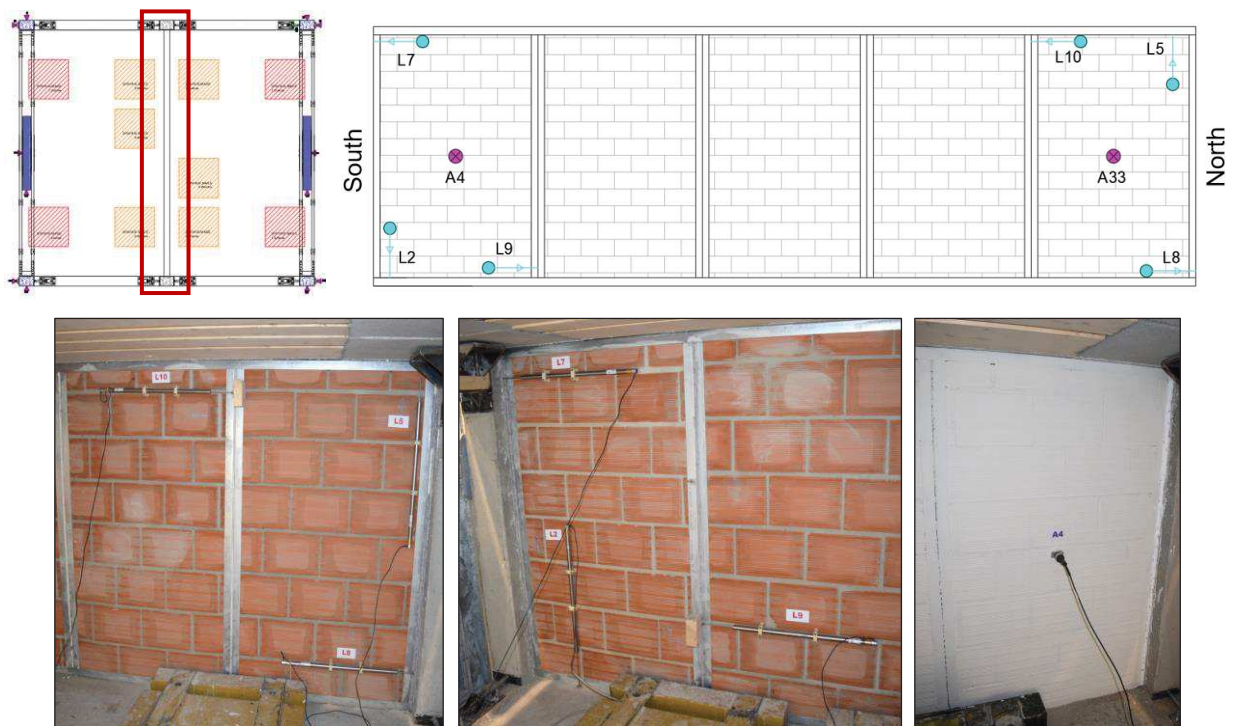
Instrumentation plan for the masonry infill wall: schematic drawing (top) and photos (bottom).
